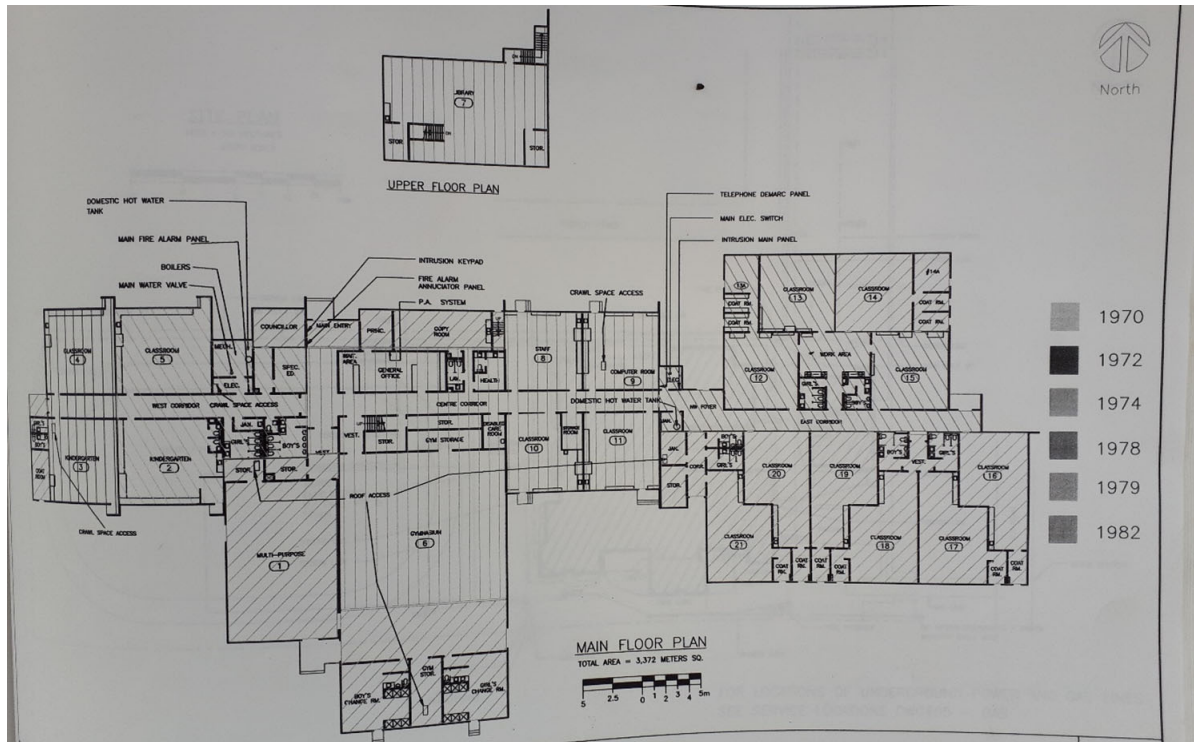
Floor plan of Parkview Elementary School. Not to scale.
